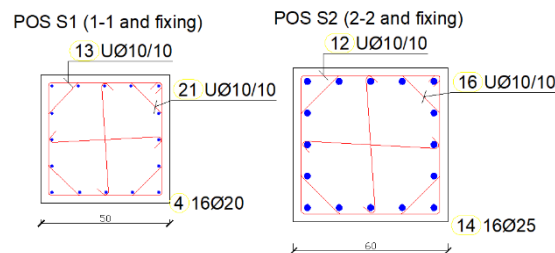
Adopted reinforcement in columns S_1 and S_2 for structure on ground type D
